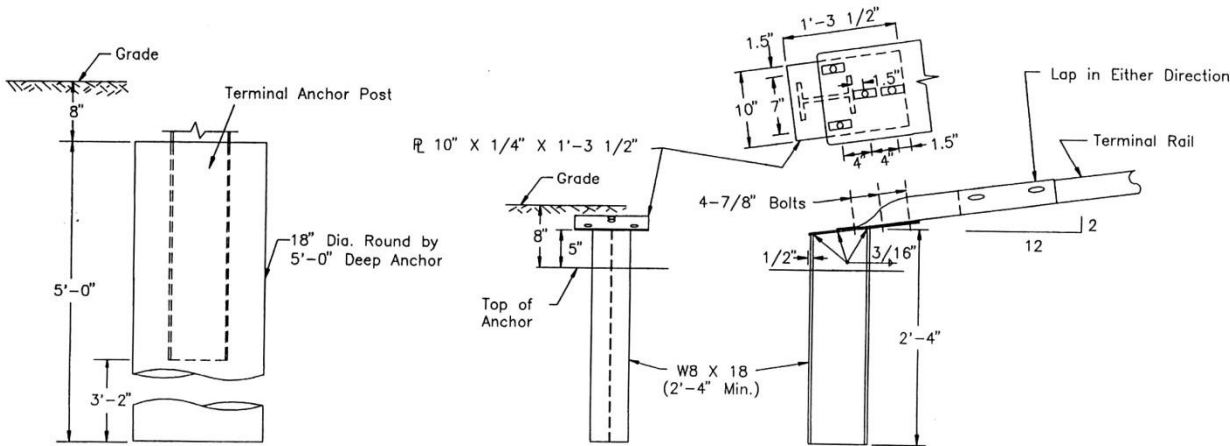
Turned-Down Anchor Details, TTI Thrie Beam Short Radius System [8]
